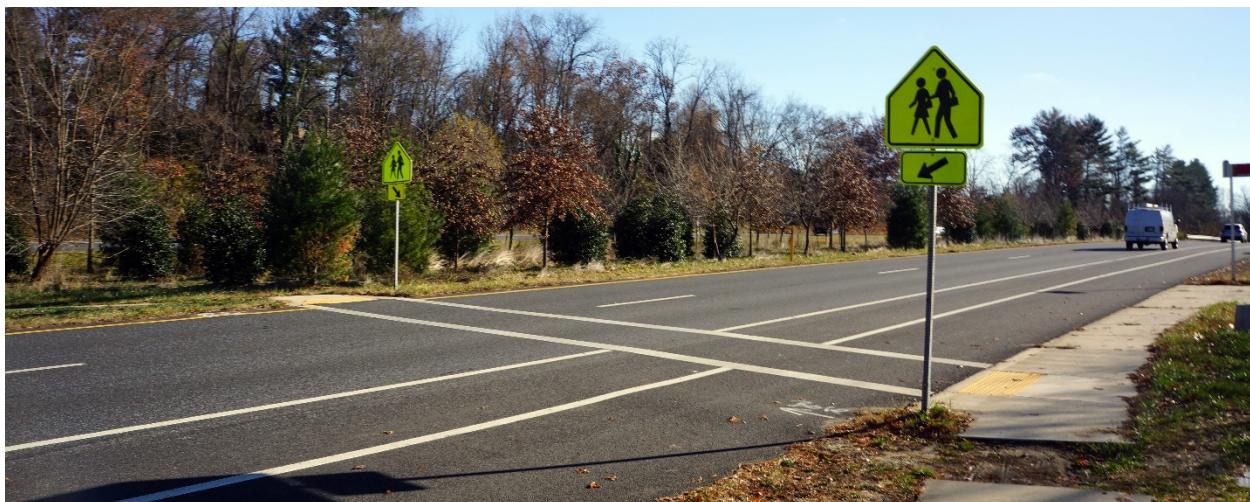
Pavement markings at the Pyle Road crosswalk are missing diagonal hatching
